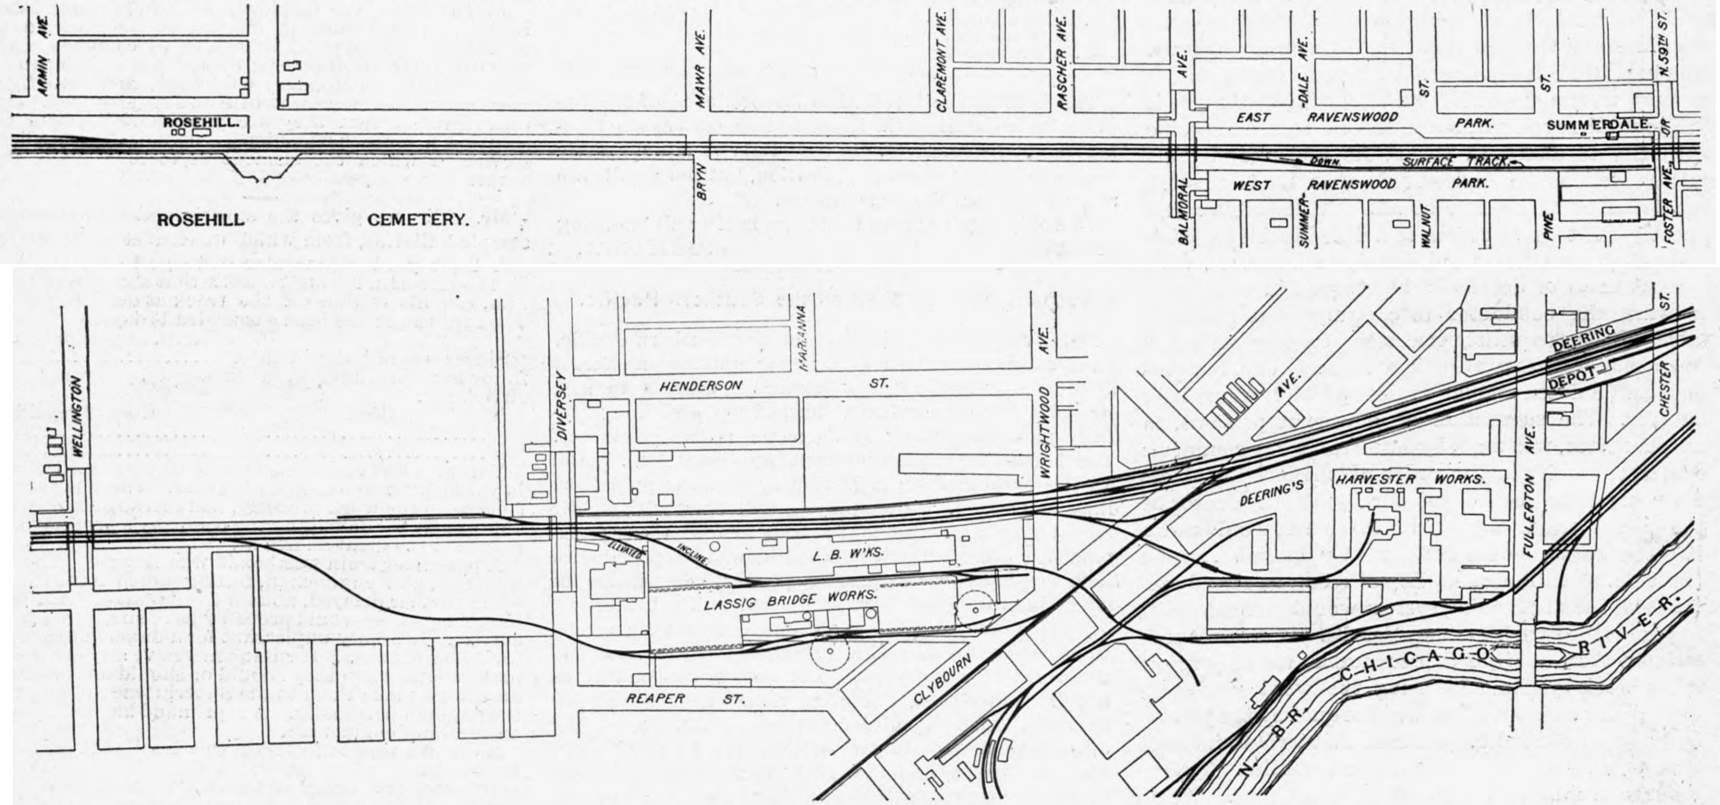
Plan of Part of the Milwaukee Division, Chicago & Northwestern Railway—Showing North and South Ends of Track Elevation.
